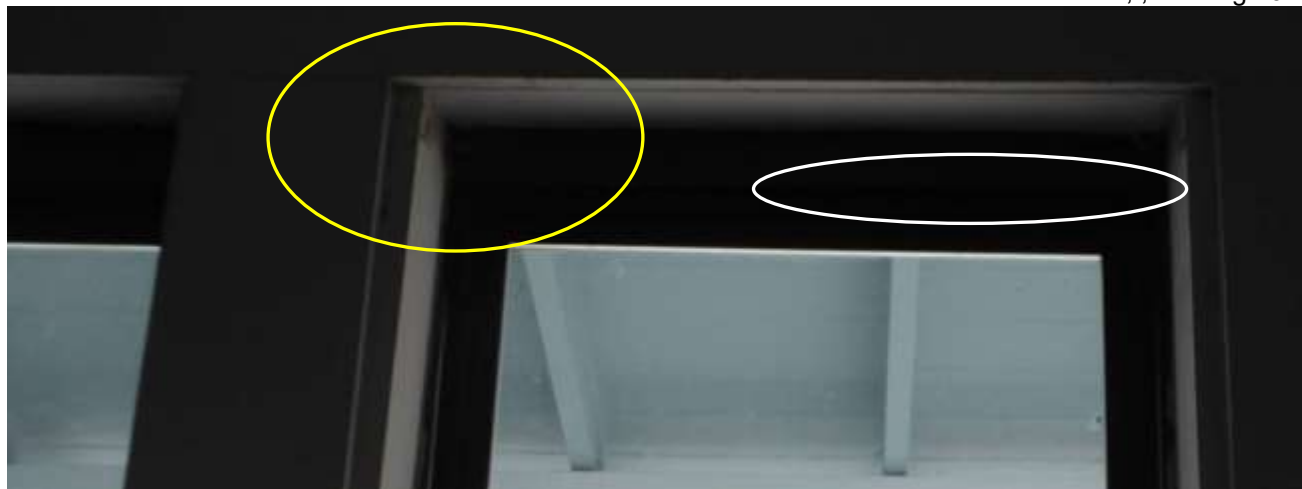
Example of water stains and gaps on windows in home where improperly installed and canted. See window section comments.
